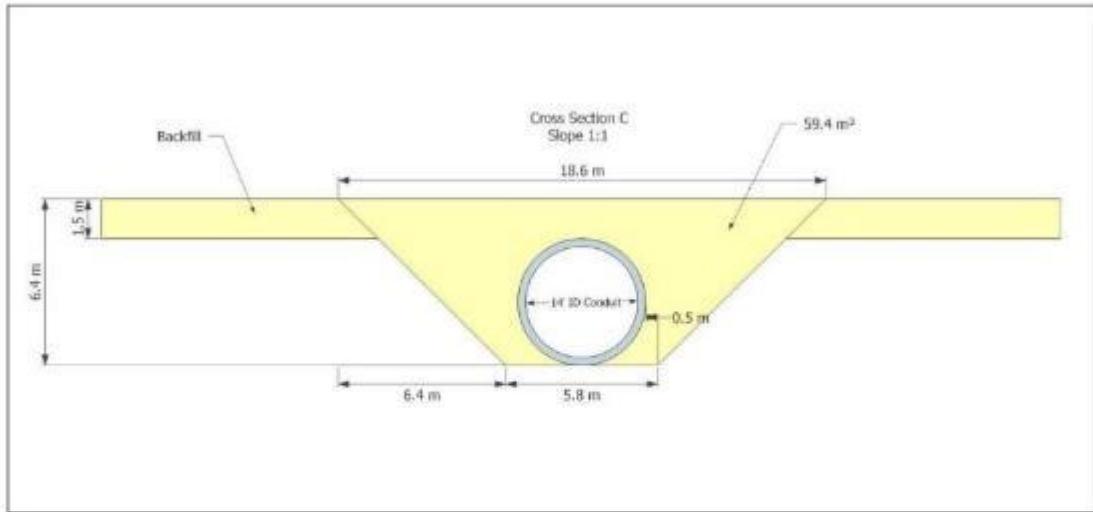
Cross-section C showing trench for removal of 14-ft (4-m) ID discharge conduit with side slope 1:1.
